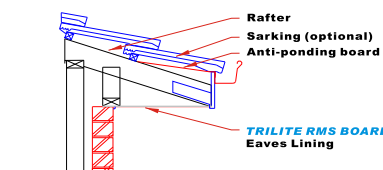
Simple Spanning Eaves - Brick Veneer Wall
